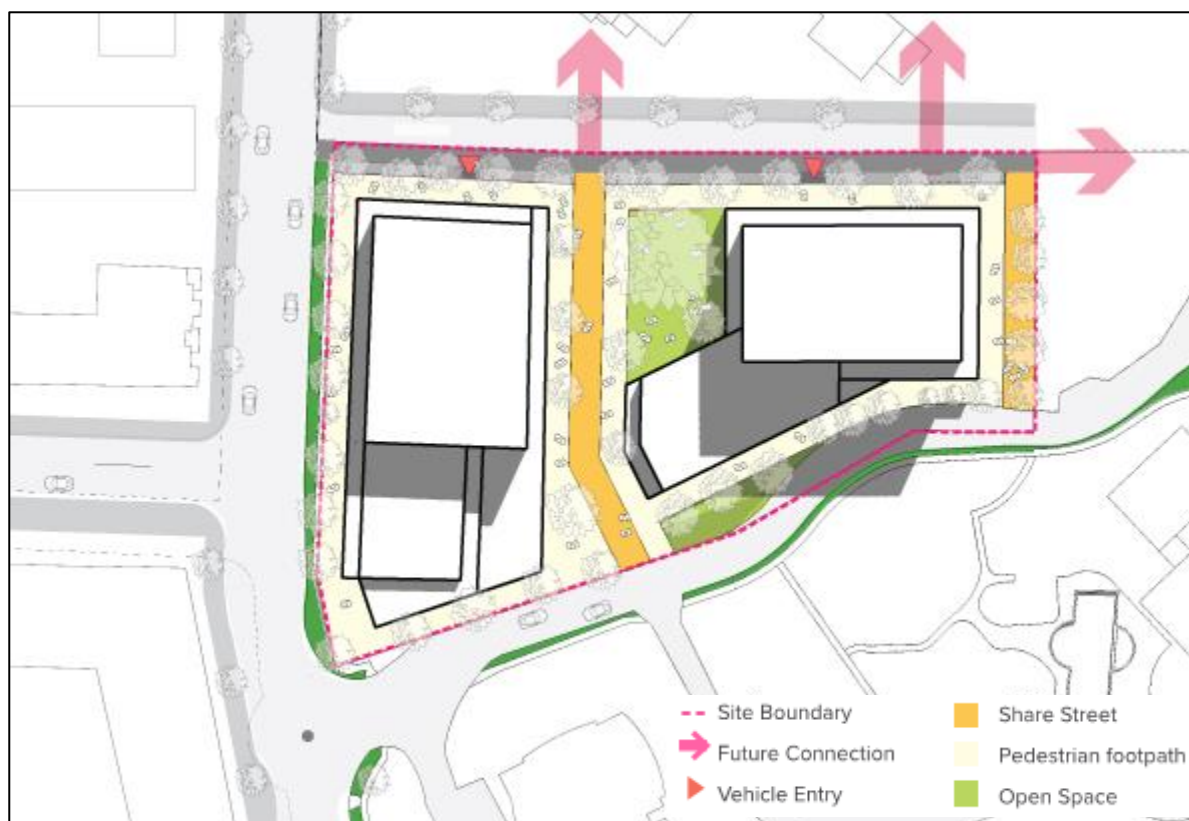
Master Plan Concept for 93 Bridge Road, Westmead (Roberts Day 2020)
